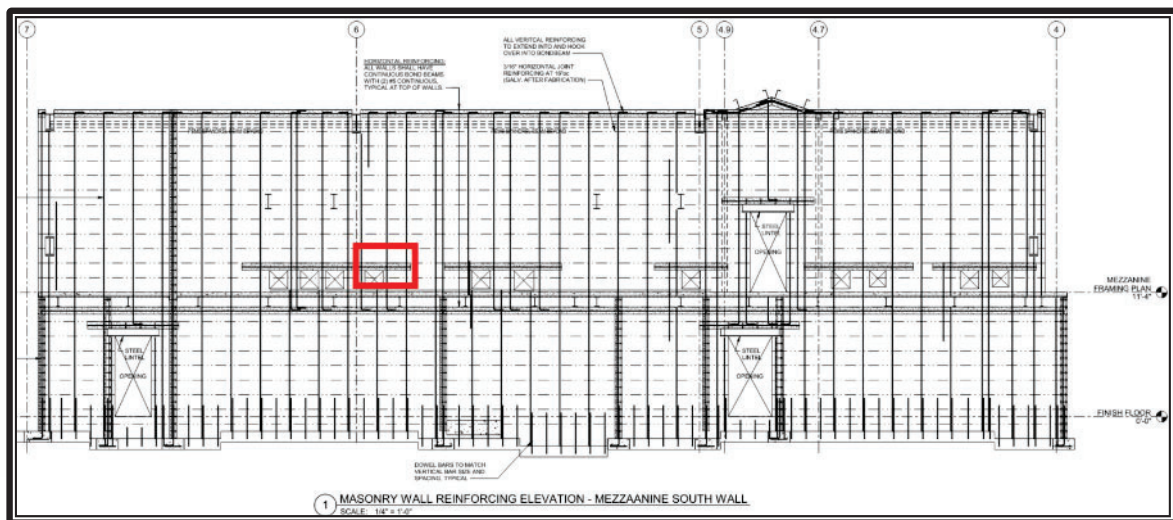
CMU wall elevation showing the approximate location of Test Area 1 (outlined) (cropped plan courtesy of T&V).
